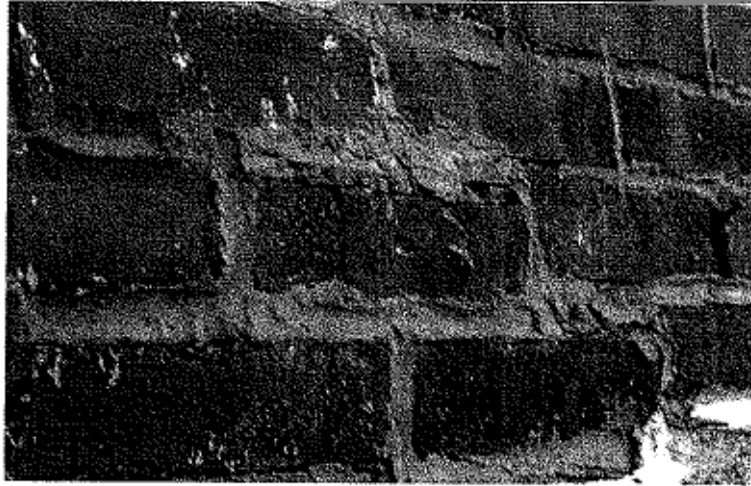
Cracked, weathered and loose mortar joints. Typical condition observed on the east, west and south elevations masonry surfaces.
